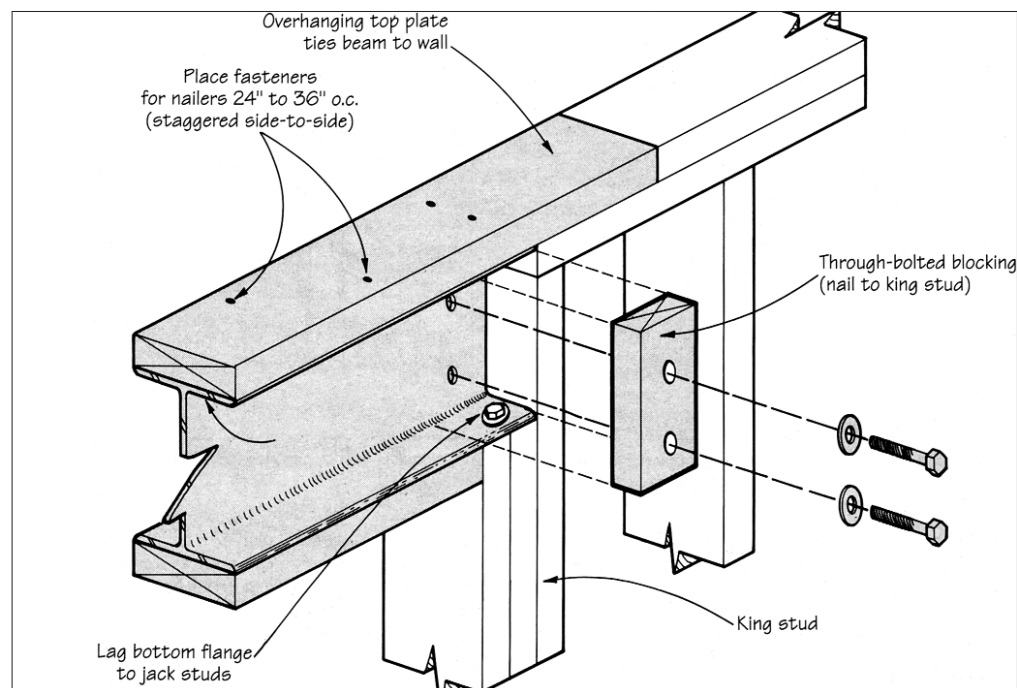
Attach wood nailers to the top and bottom flanges of a steel beam with small-diameter bolts or powder-actuated fasteners, spaced 24 to 36 inches on-center and staggered side-to-side. The overhanging nailer on top splices into the top plate of the adjacent stud wall. Lag bolt the bottom flange down into the jack studs, and toenail through the king stud into vertical wood blocking bolted to the web.
